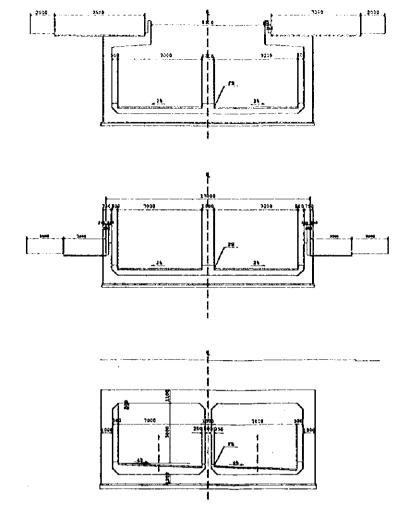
Al Yarmouk Underpass Typical Cross Sections
